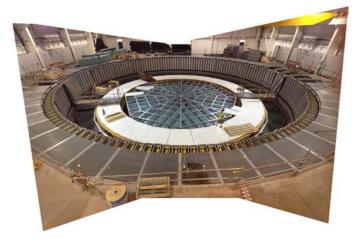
Completed floor frame installation, prior to installation of the buoyancy tanks
